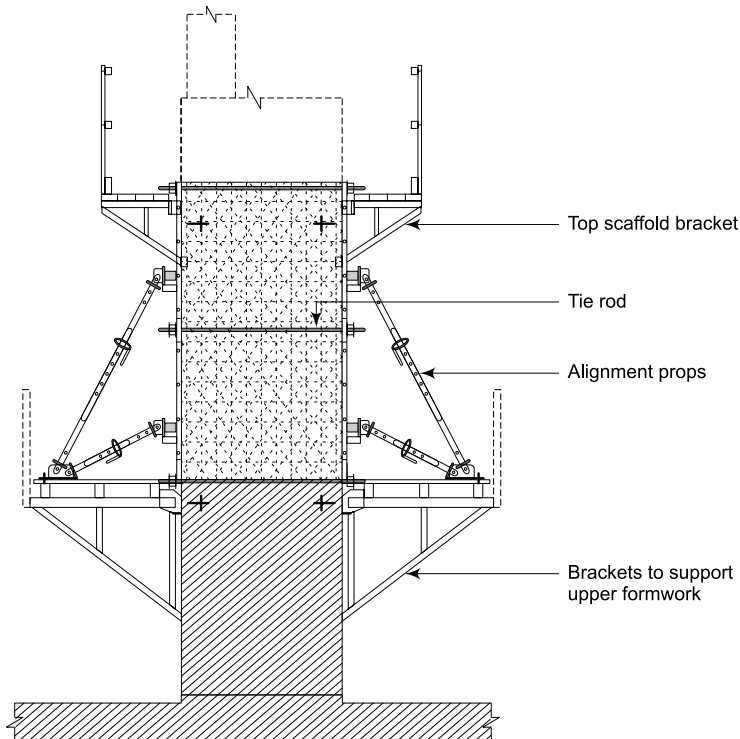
Sectional View of Formwork Arrangement for Upper Lift.
